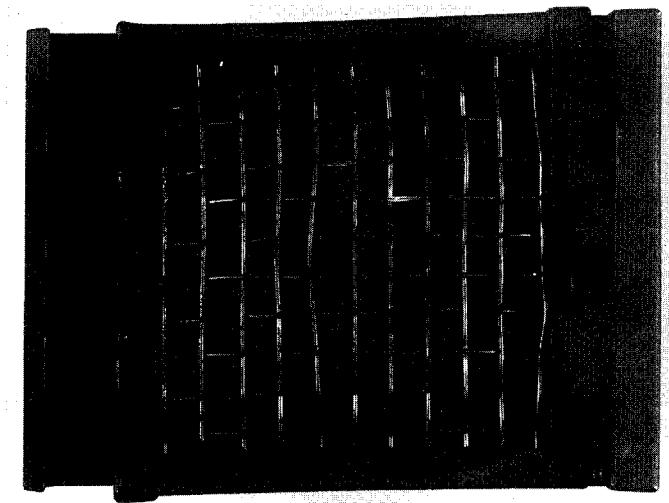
STEEL MESH TO HOLD INSULATION FROM LARGE GAUGE WIRE IN PLACE
